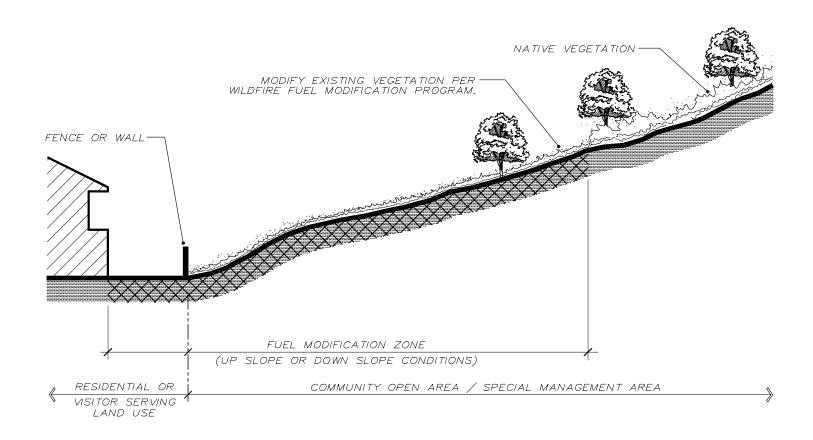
TYPICAL FUEL MODIFICATION SECTION
